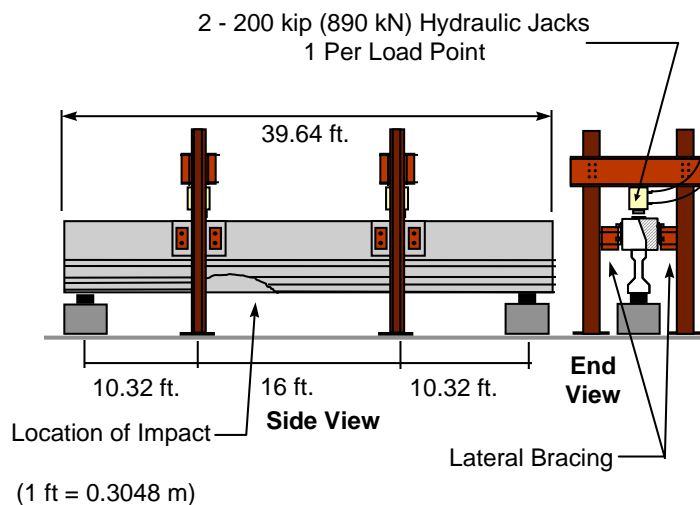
Schematic of Test Setup and Loading Frame for Steck Girder Load Tests
